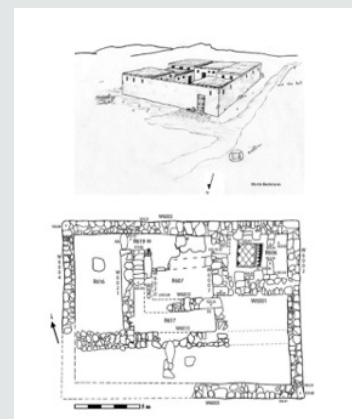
a) Building 600 at Tall Jawa; possible reconstruction, b) Building plan of lower storey.
